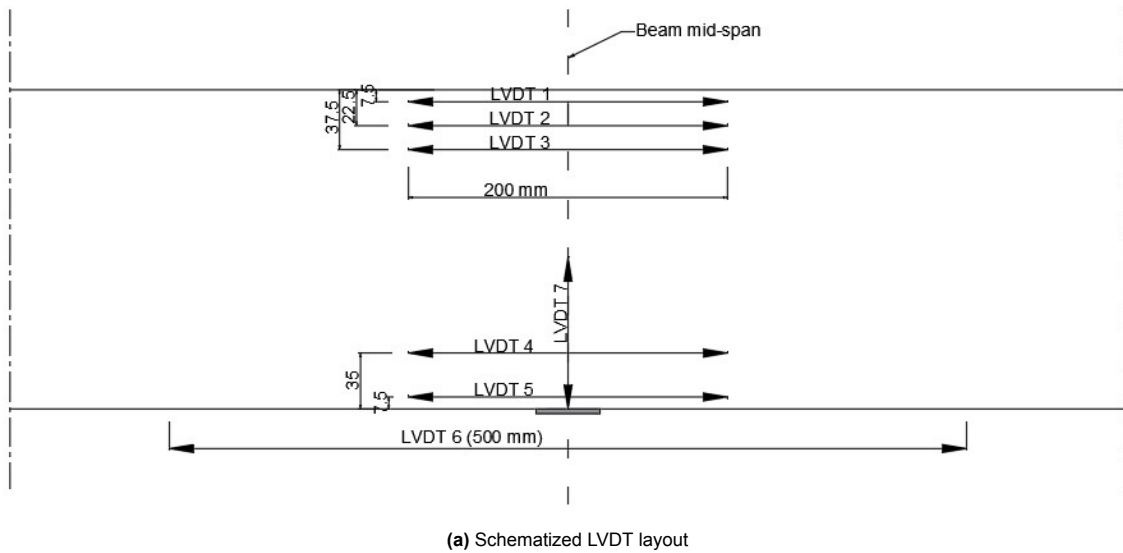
Side view of beam samples: LVDT layout at beam mid-span
